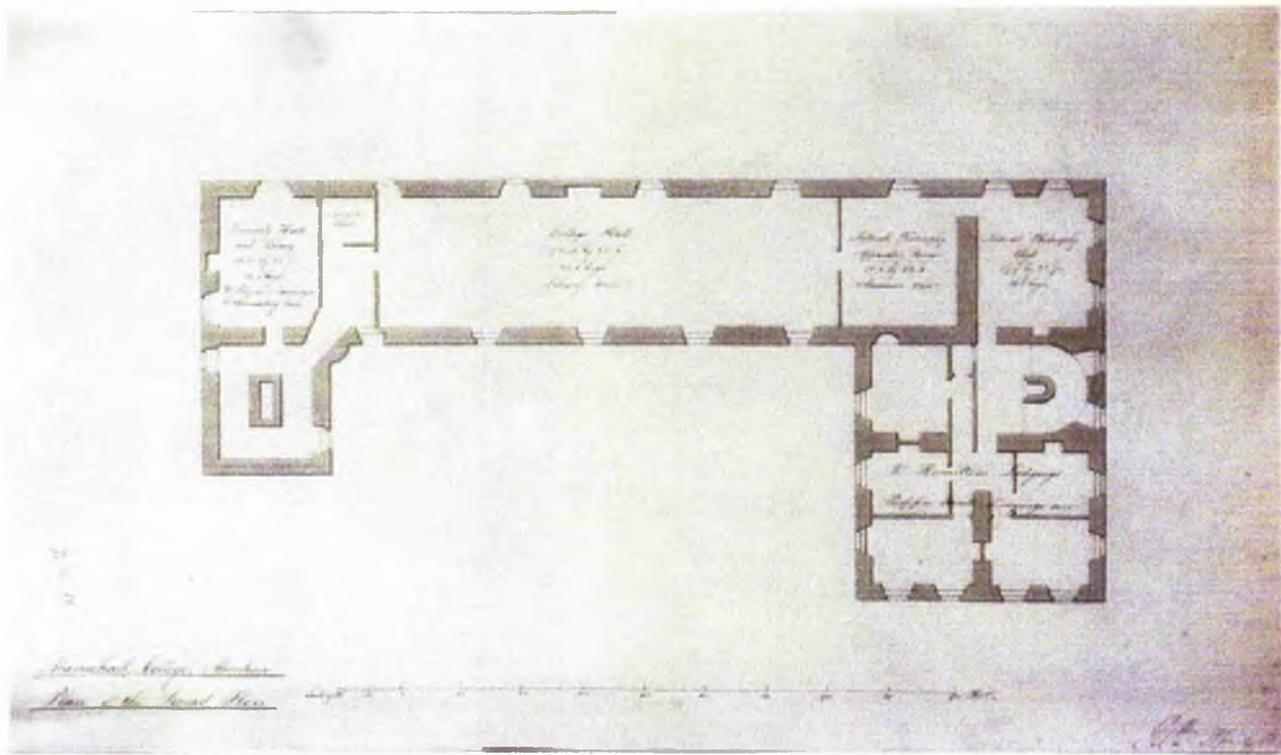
Marischal College. Survey of existing first floor. R. Reid, 1834.
